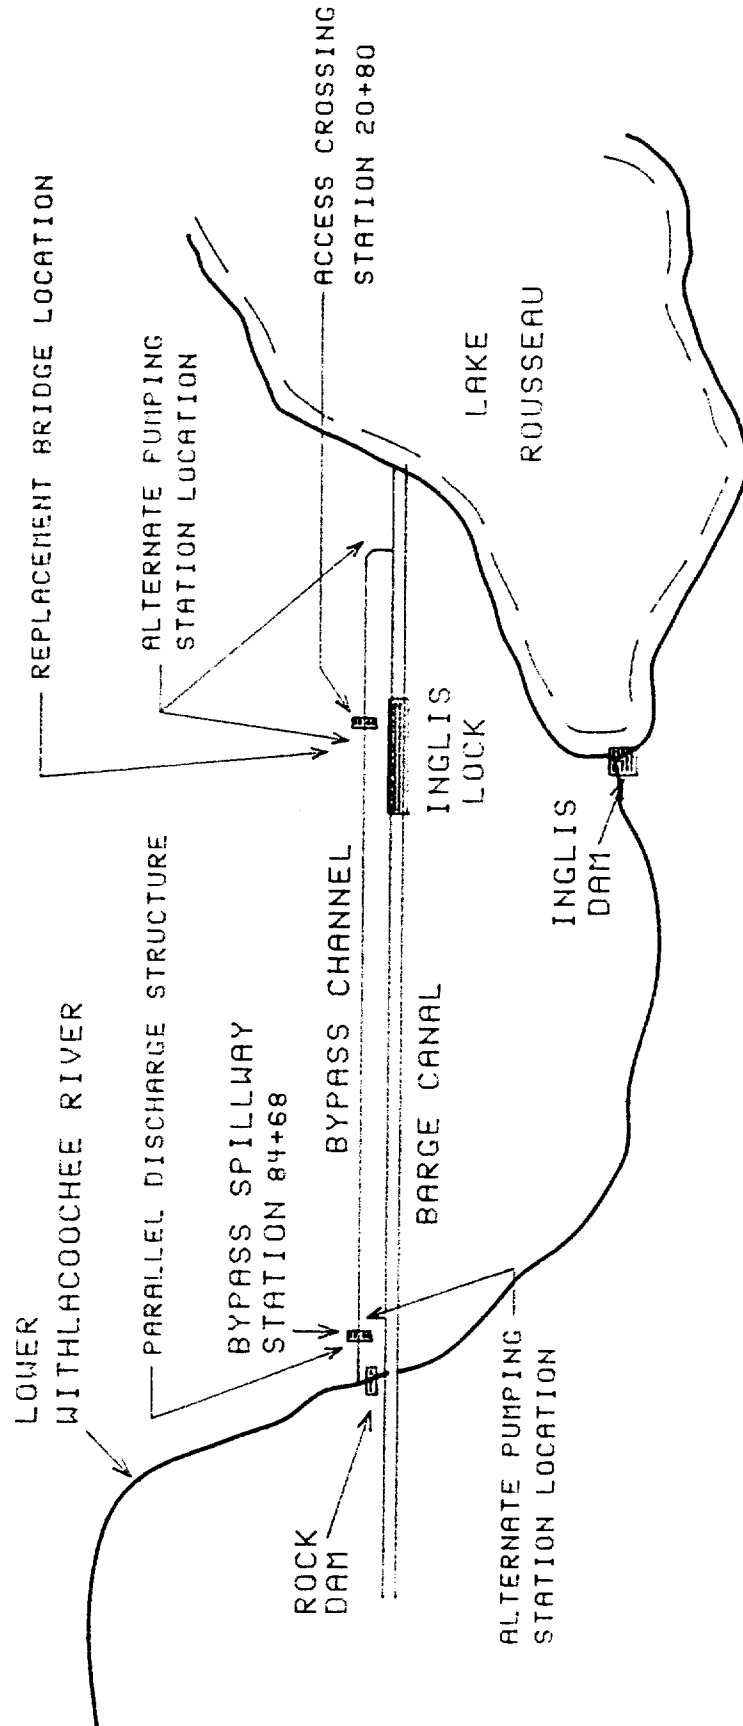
POTENTIAL LOCATION OF BYPASS STRUCTURE MODIFICATIONS NECESSARY TO FACILITATE A DRAWDOWN.
